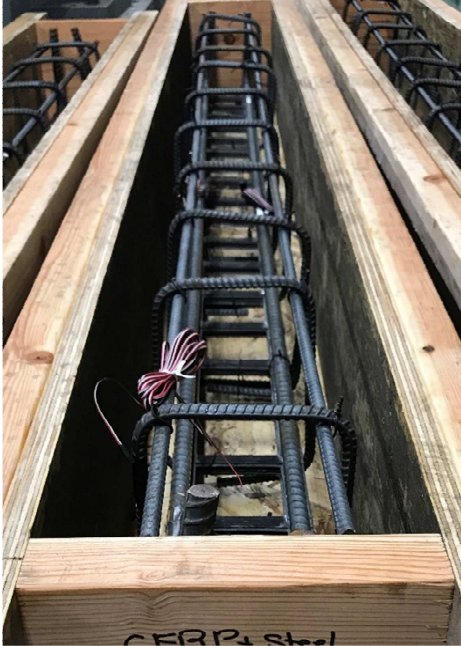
Installation of Strain Gauges and Reinforcement Cage for 4 CF/ST Beam
